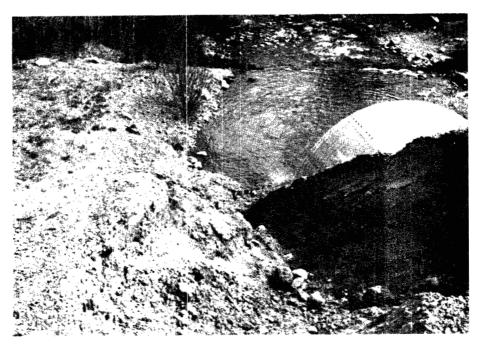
For problem description, see Plate 41. Fill has high sand content. Wolf Creek, Alaska Highway, km 1459. Reconstructed section.
